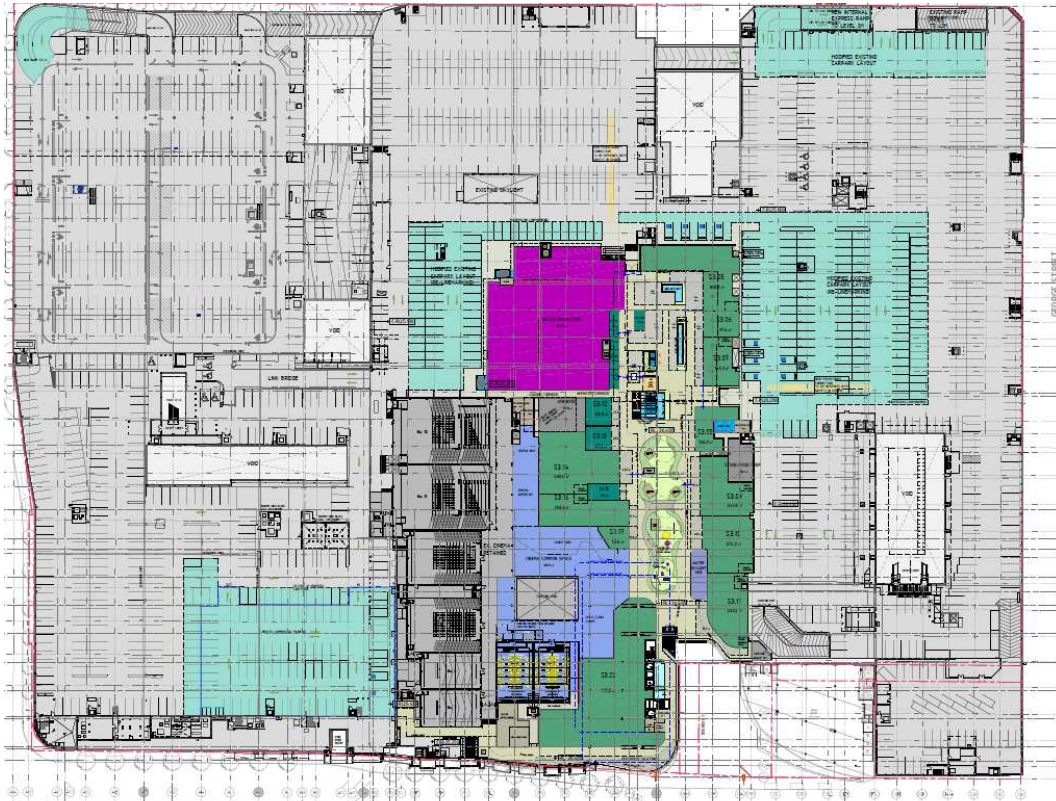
Plan showing the proposed new construction on rooftop (Retail Level 3)
